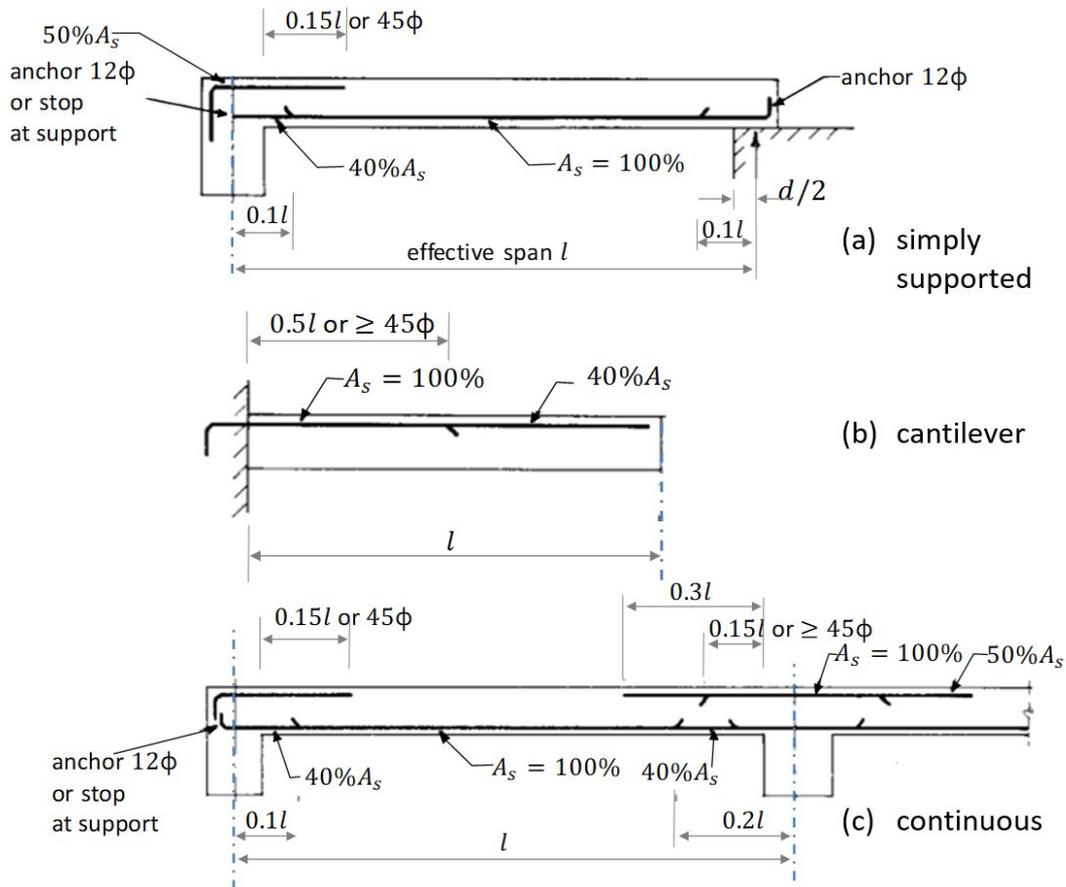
Curtailment and anchorage of reinforcement in slabs
